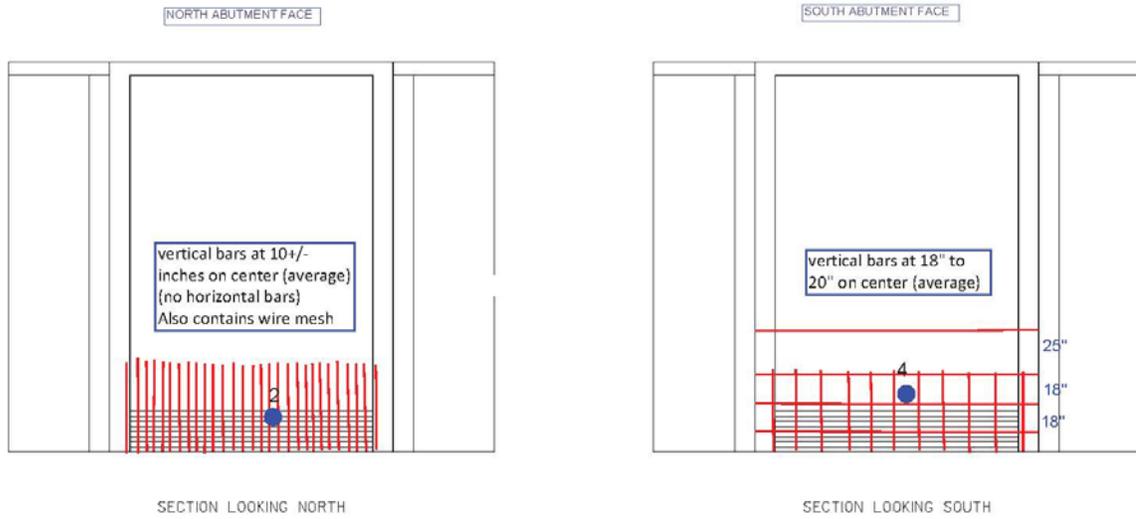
CONCRETE IMAGING RADAR RESULTS AND CONCRETE CORE LOCATIONS
